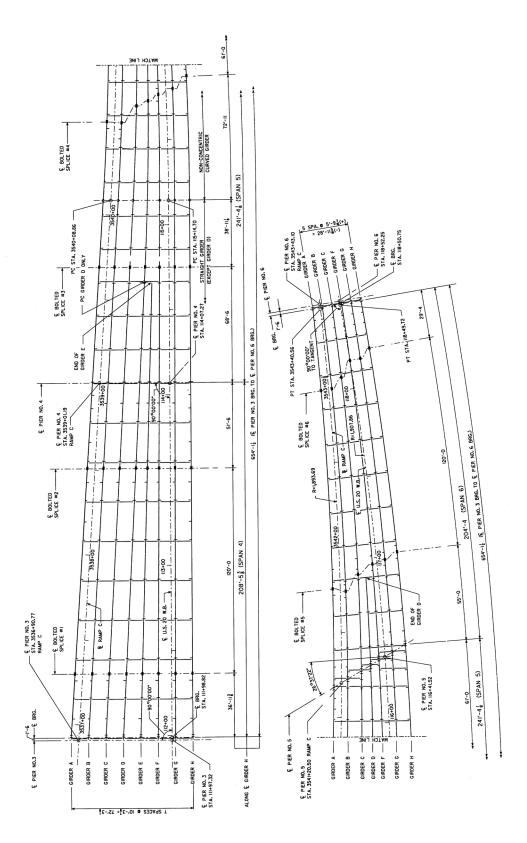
U.S. 20 Westbound Iowa Approach Bridge Framing
